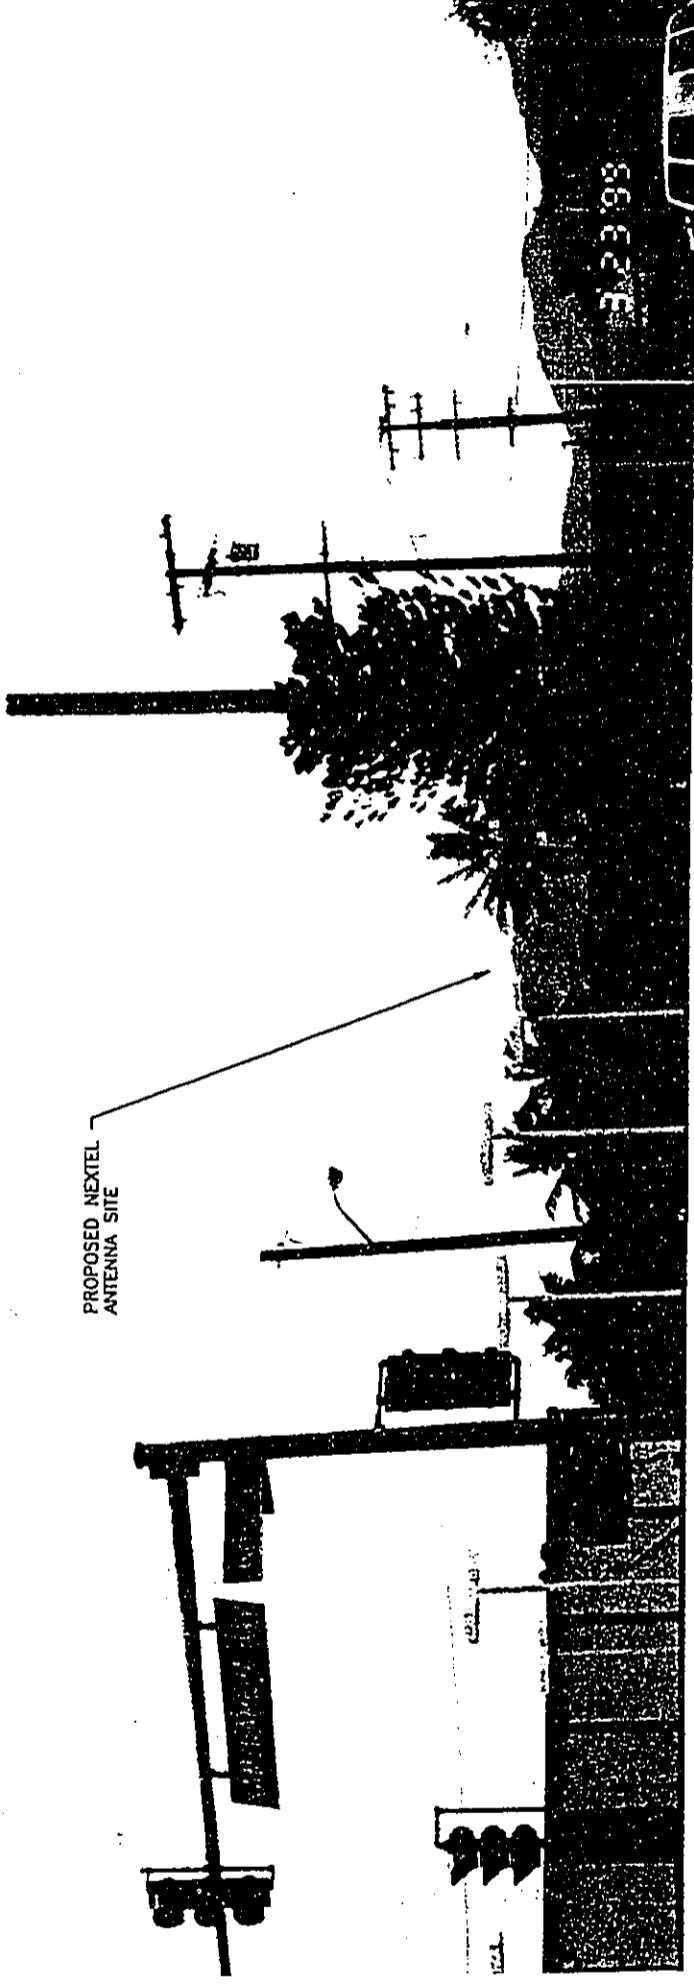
TELEPHOTO SHOT FROM PHOTO 1 VANTAGE POINT (90 mm lens)
